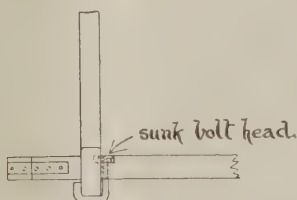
Method of Fastening Platform Boards to Hanger.
